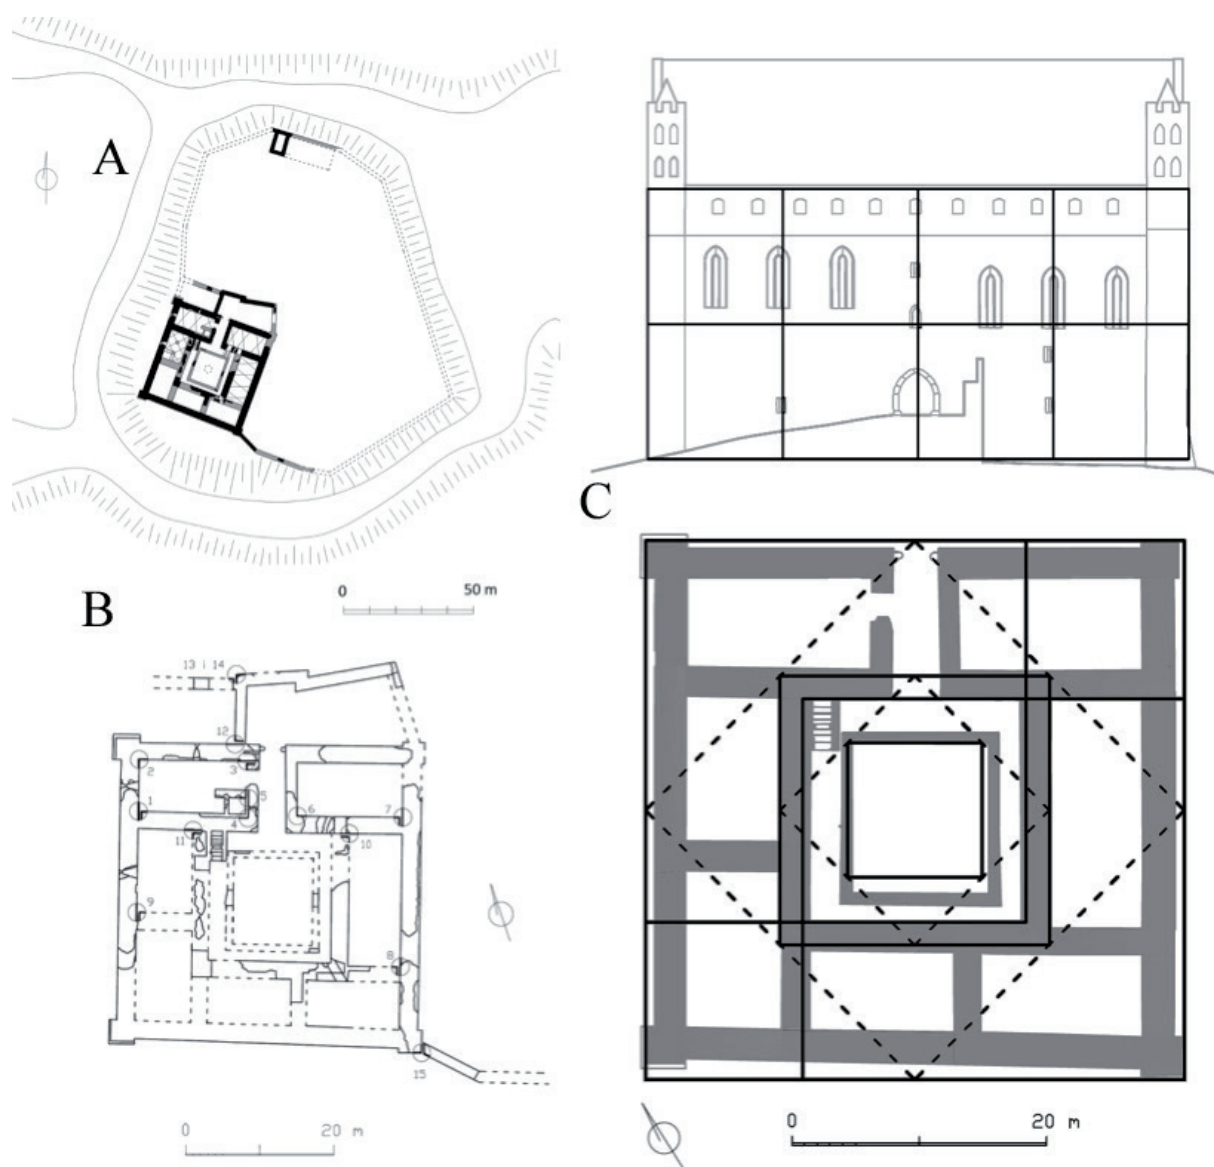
The castle at Papowo Biskupie – reconstruction of the ground plan (A), projection of the high castle after excavation works (B), reconstruction of the castle design using a ad quadratum geometrical method. Elaborated by B. Wasik. – *Obr. 5. Hrad v Papowo Biskupie – rekonstrukce půdorysu (A), plán jádra hradu po exkavaci (B), rekonstrukce nákresu hradu za použití geometrické metody „ad quadrantum.“ Zpracoval B. Wasik.
